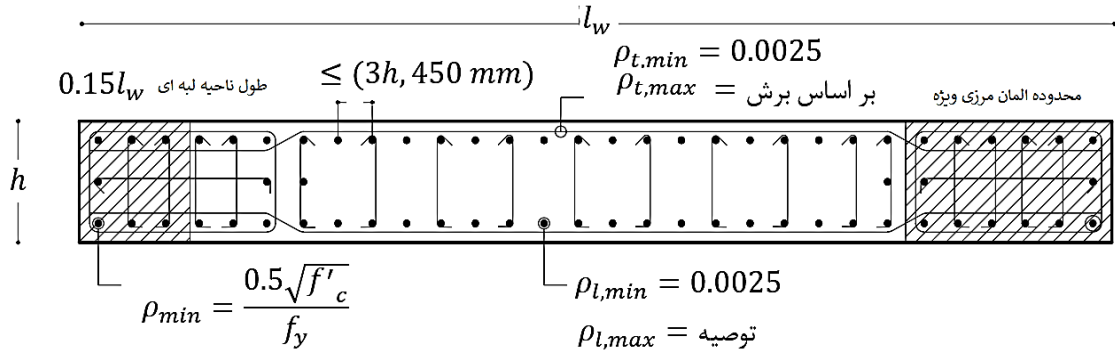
Locations of longitudinal reinforcement required by 18.10.2.4(a) in different configurations of wall sections.
